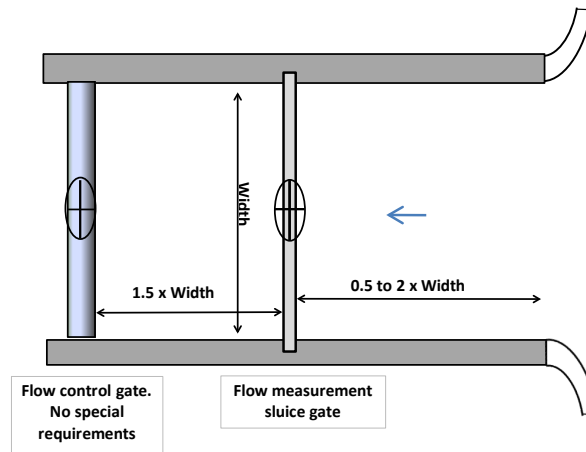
Plan view of CHO constructed in earthen canal. Not to scale. Rounded entrances are recommended.
